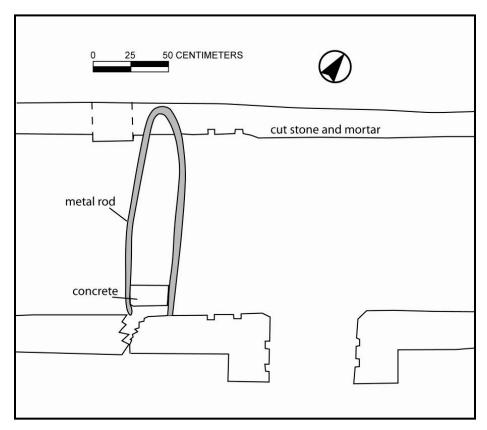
Plan view of Sluice Gate Location 2 (notice the notches in the walls for the sluice gates to slide into) (SIHP # -4664)
